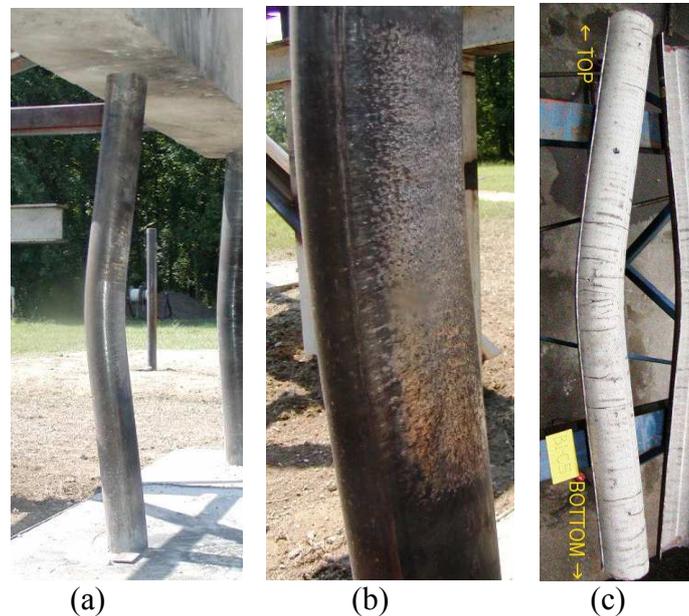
Column subjected to charge at mid-height: (a) column deformation; (b) column surface around mid-height; (c) core concrete
